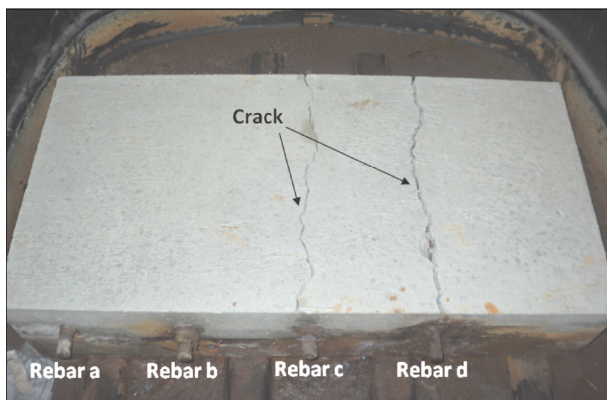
Concrete slab image after accelerated corrosion.
